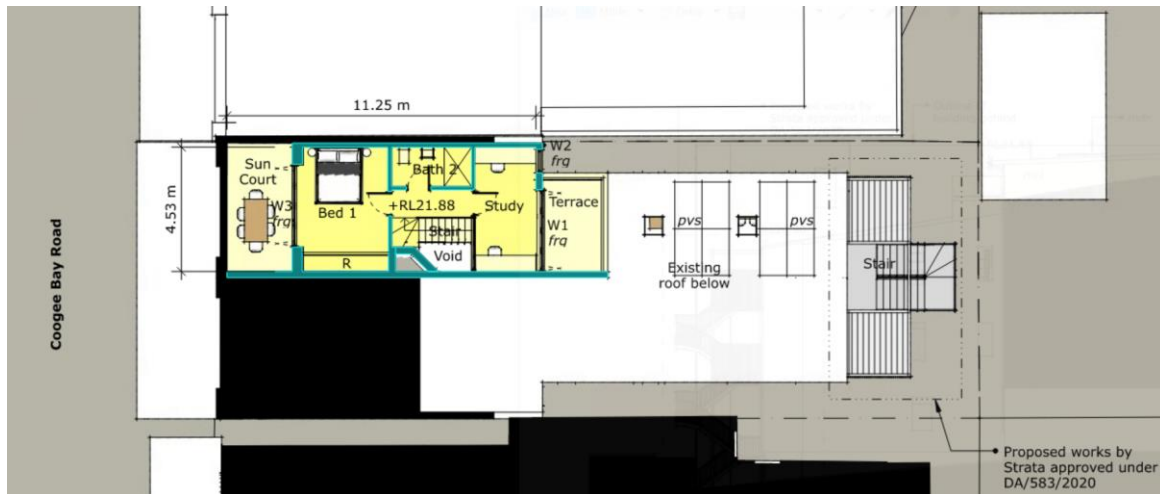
Proposed Level 3 floor plan (Source: Saltbush)
